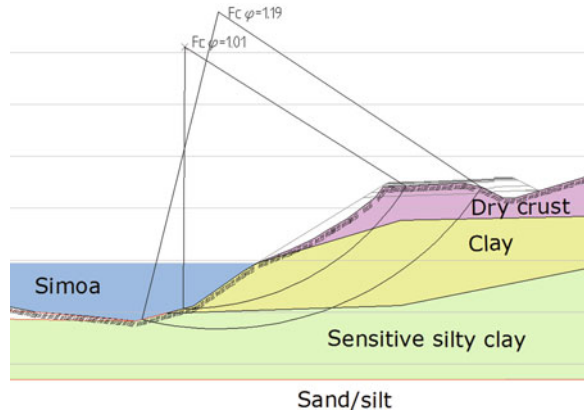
A typical section showing the erosion protection and the lightweight fill
